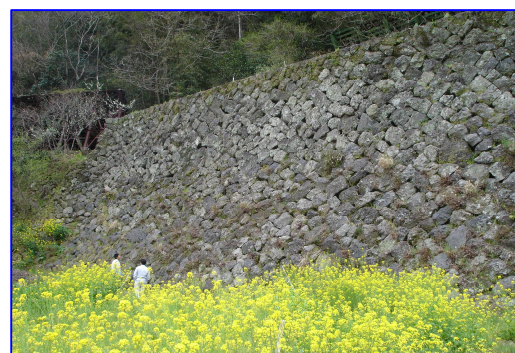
Ishigaki-no-mura rice terraces use 11 meter-high stone walls
